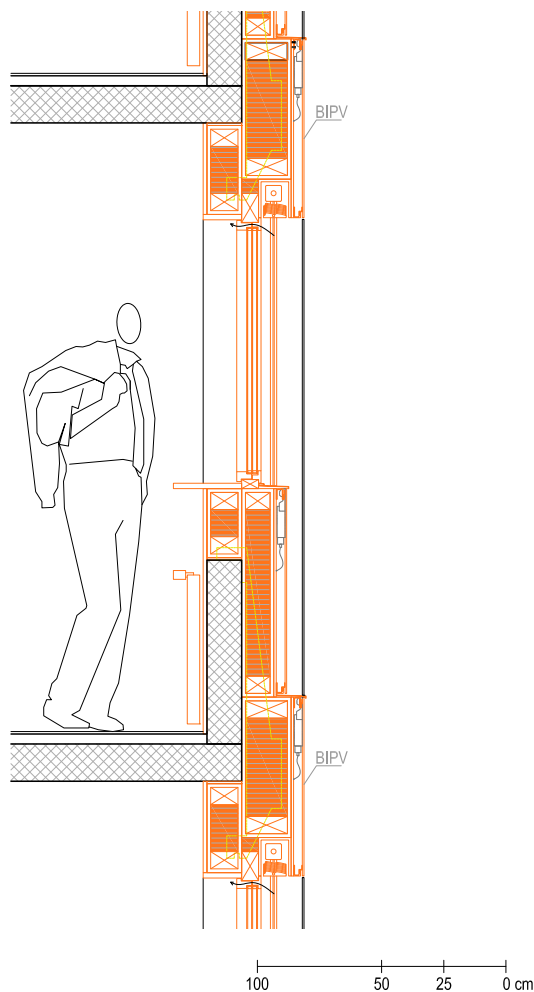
Facade construction detail, S3-Transformation, Archetype 4 [1].
